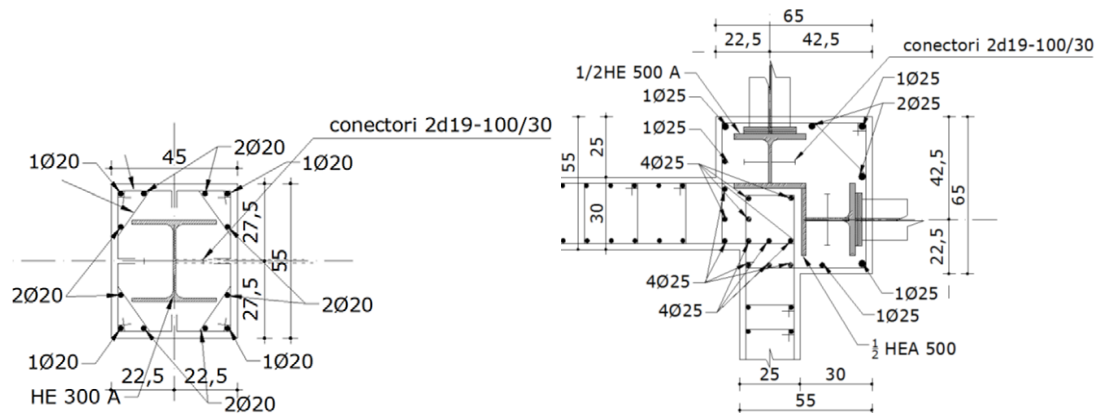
Column cross-section: Left- Exterior perimeter column; Right - Central column.
